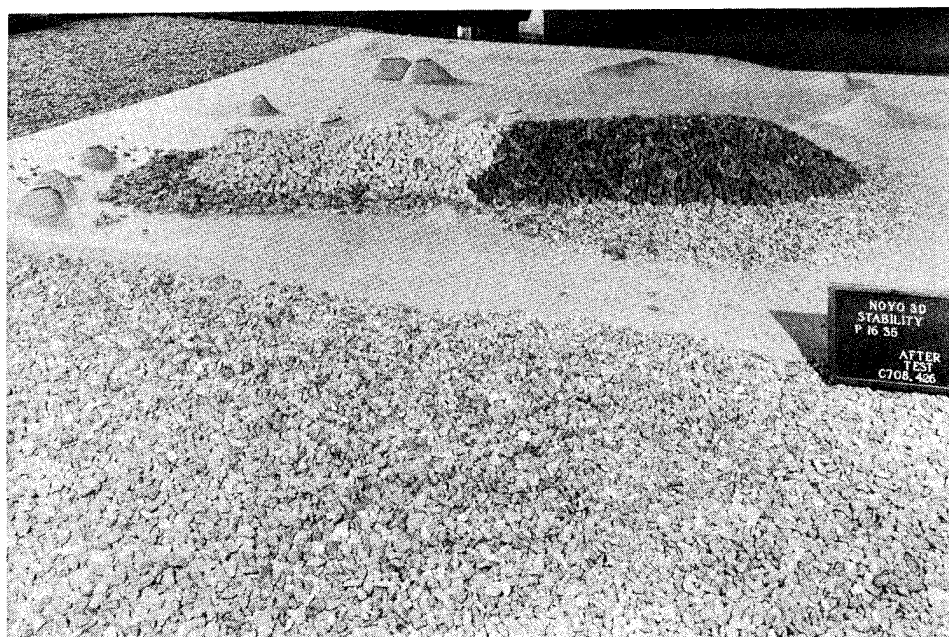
Leese view of Plan 16 after five series of modified Storm IB waves
